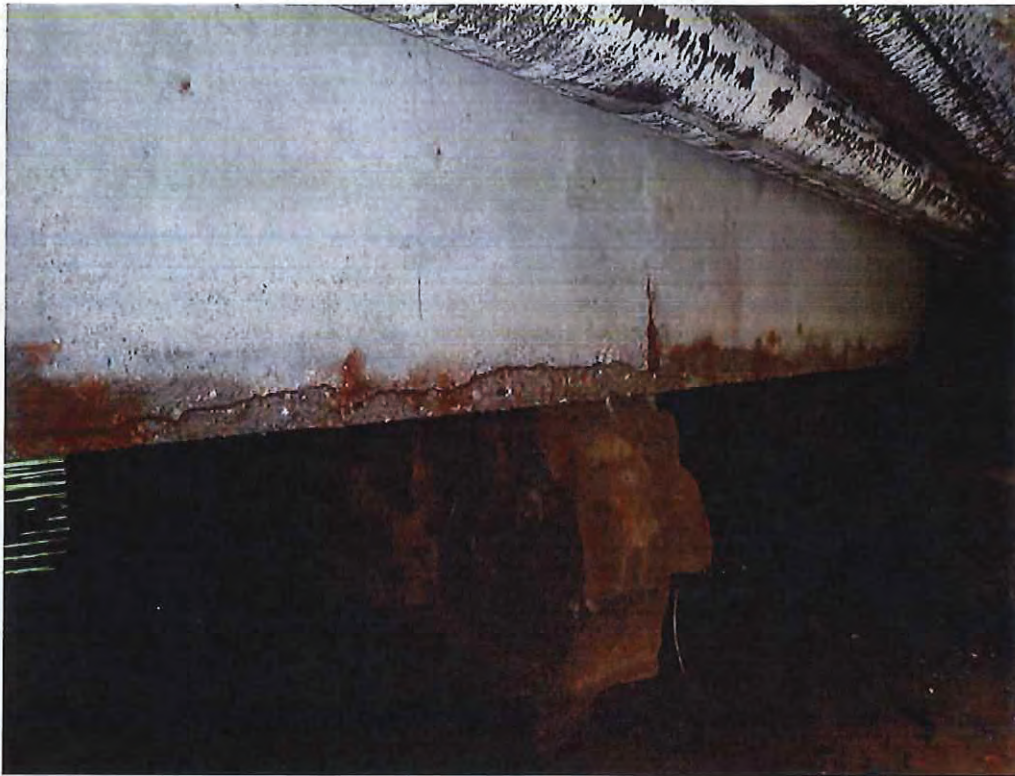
West sidewalk transverse support beam: spalling full width across the bottom face and up both north and south faces up to 12"
